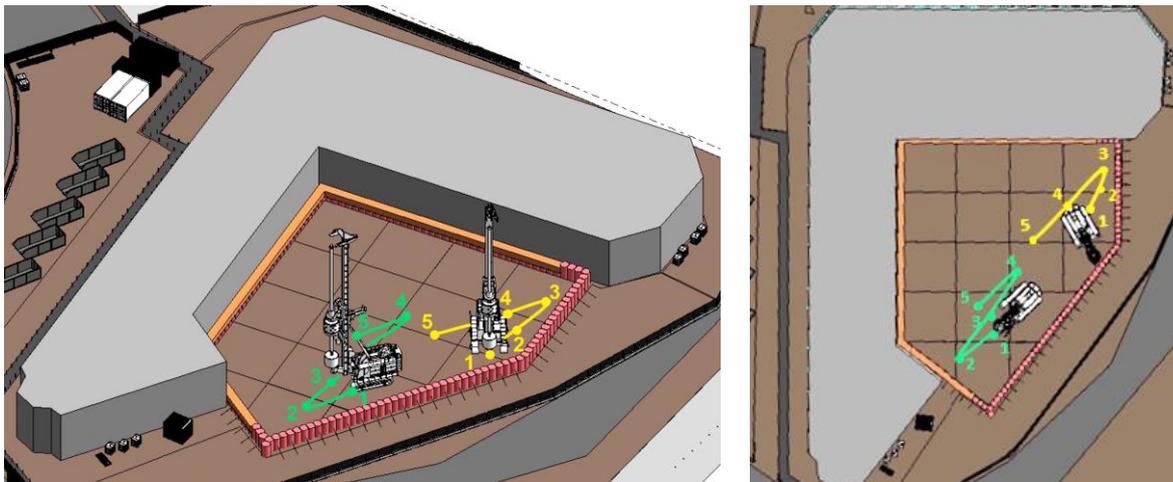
Movement path of the drilling rig shown in a digital construction site layout plan (isometric and plan views, left and right image, respectively).
